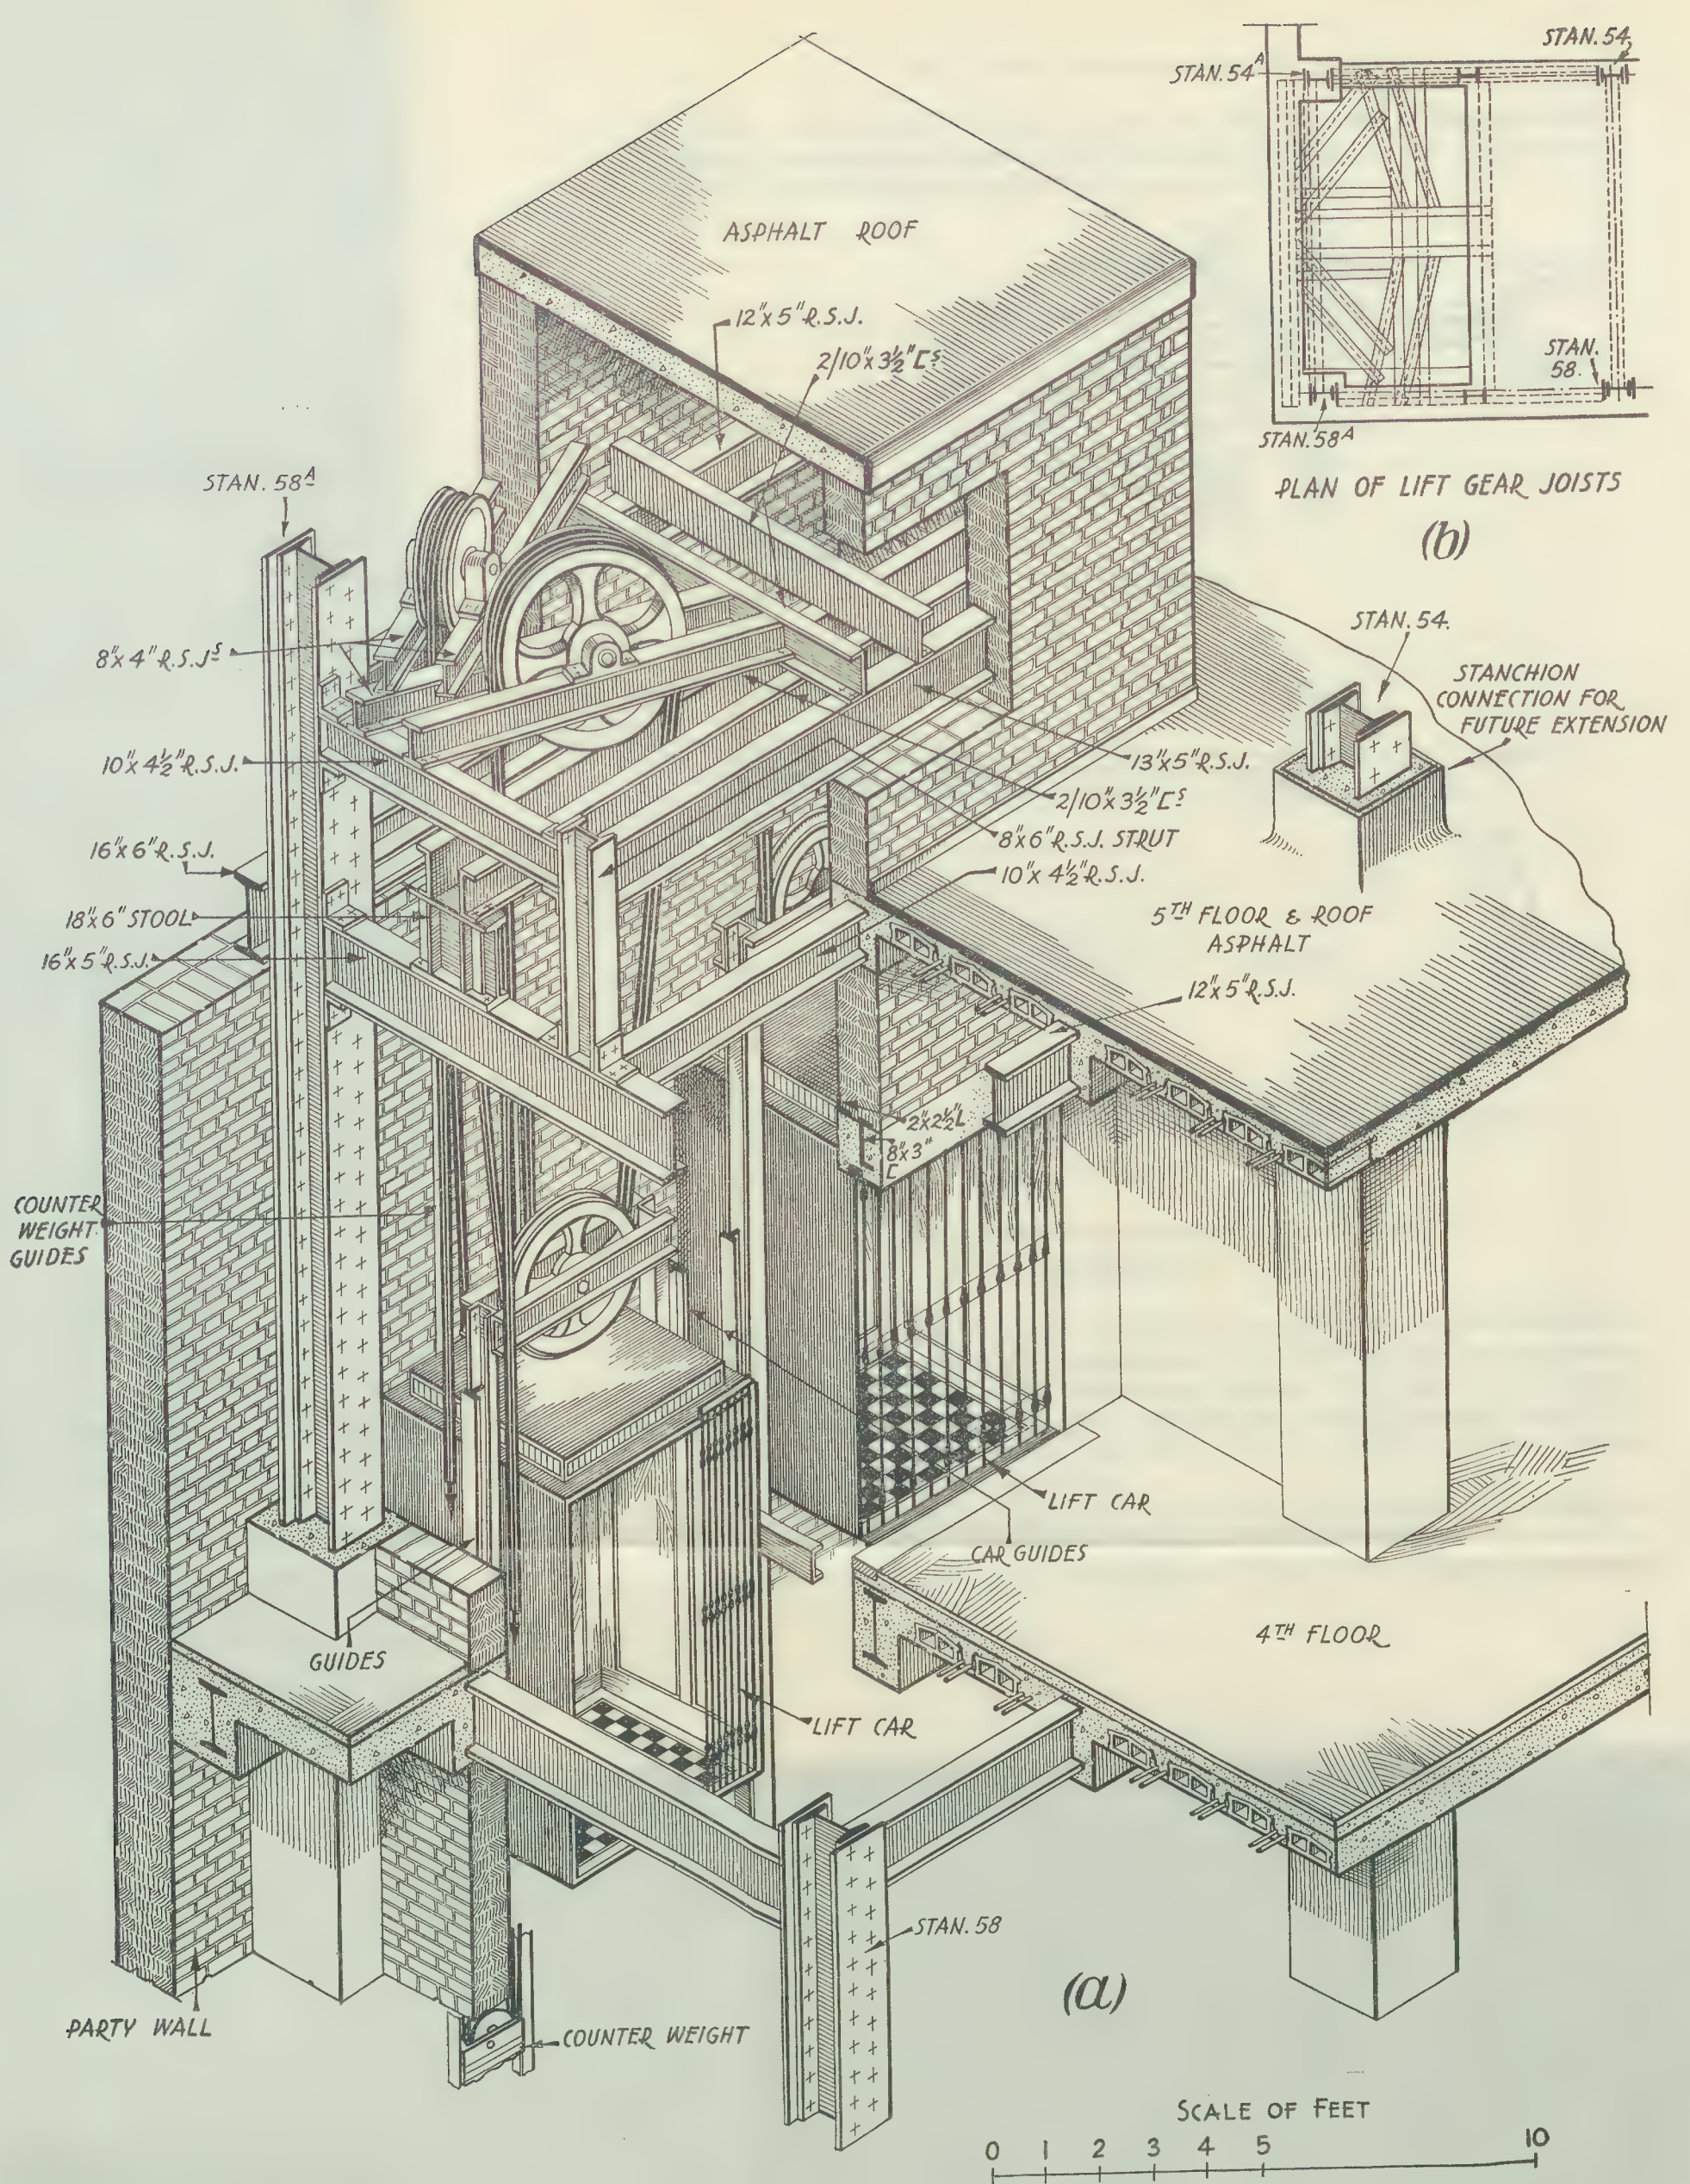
CONSTRUCTION OF PASSENGER LIFT
